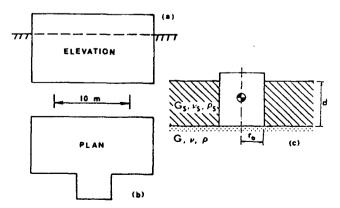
Block foundation, (a) elevation, (b) plan, (c) equivalent cylindrical foundation
